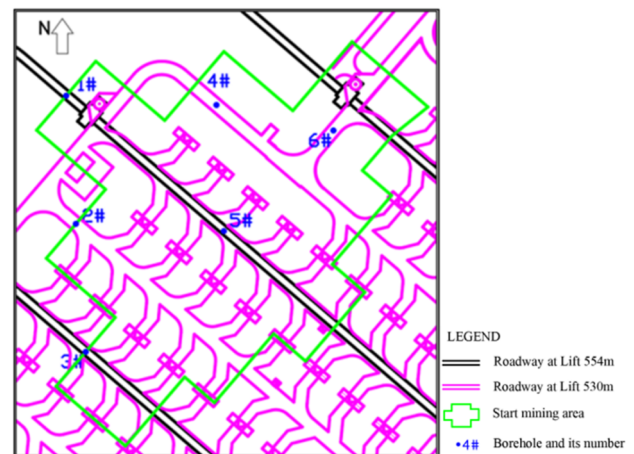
Borehole layout for hydraulic fracturing pre-conditioning project.
